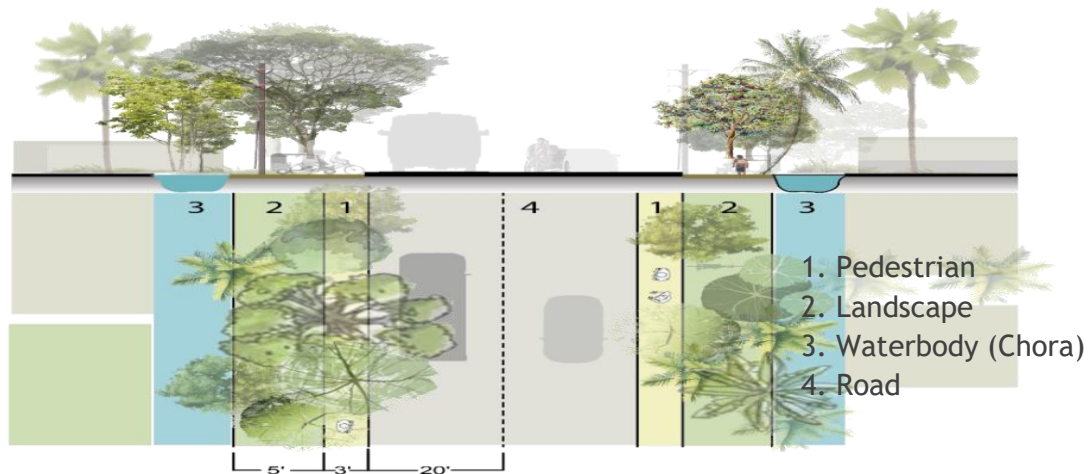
MC College Street analysis (section; plant profile: chart 4)(author).
